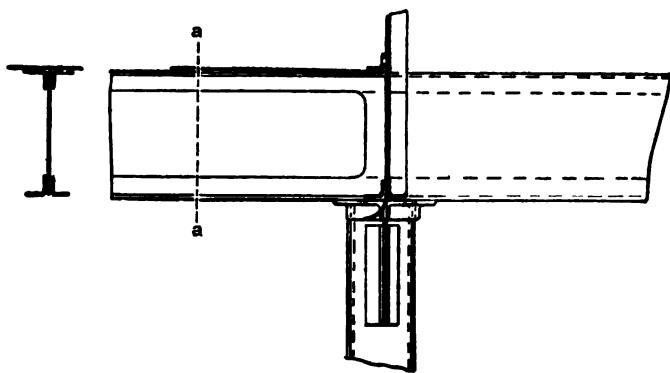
STRONG BEAM, SUPPORTED BY STANCHION.
